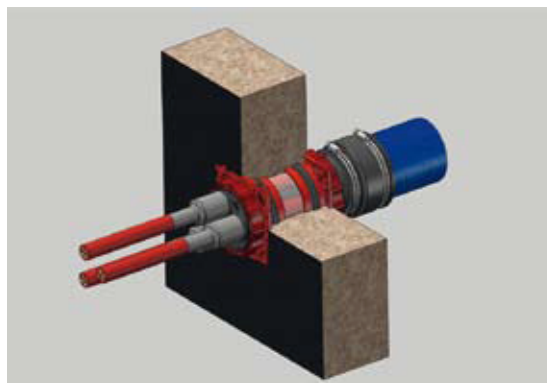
HSI 150 installed in a concrete wall and with both-sided utilization of the system seals.
